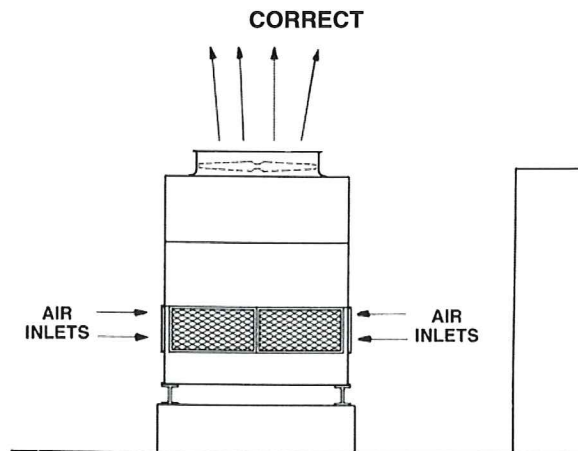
Installation Elevated so Top of Unit Is Higher than Top of Wall
